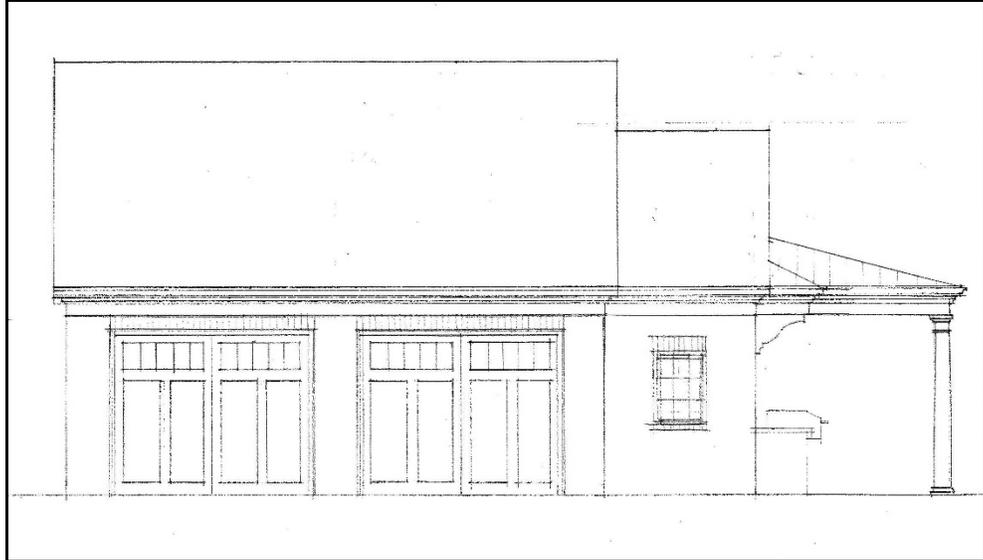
Applicant provided rendering of the proposed front elevation facing 6^t Street NE. *Note the columns, the gabled roof, and window.
